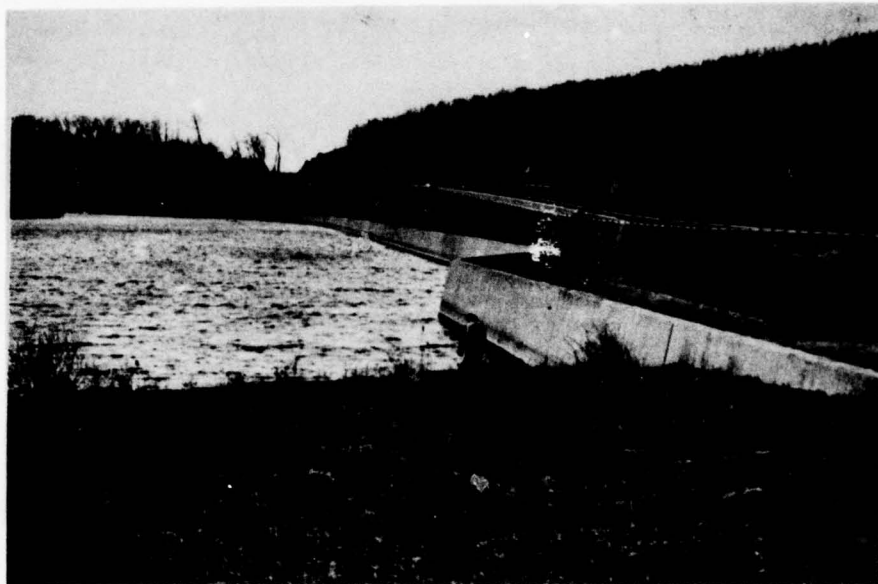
View of reservoir side of wall from right embankment; water level at 741.5 (Photo taken May 1, 1978)
